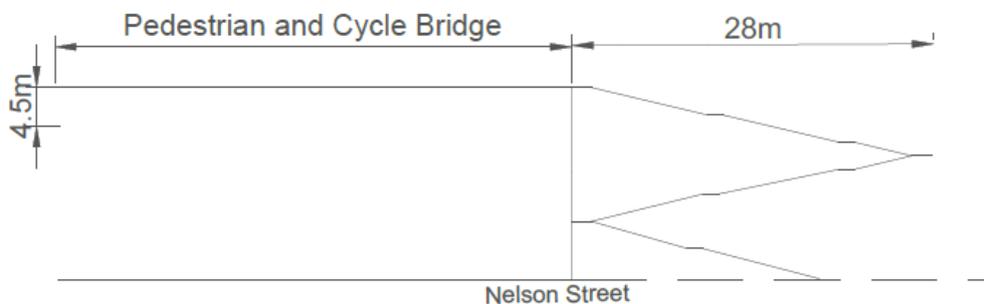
Nelson Street Back to Back Ramp option – longitudinal cross section
